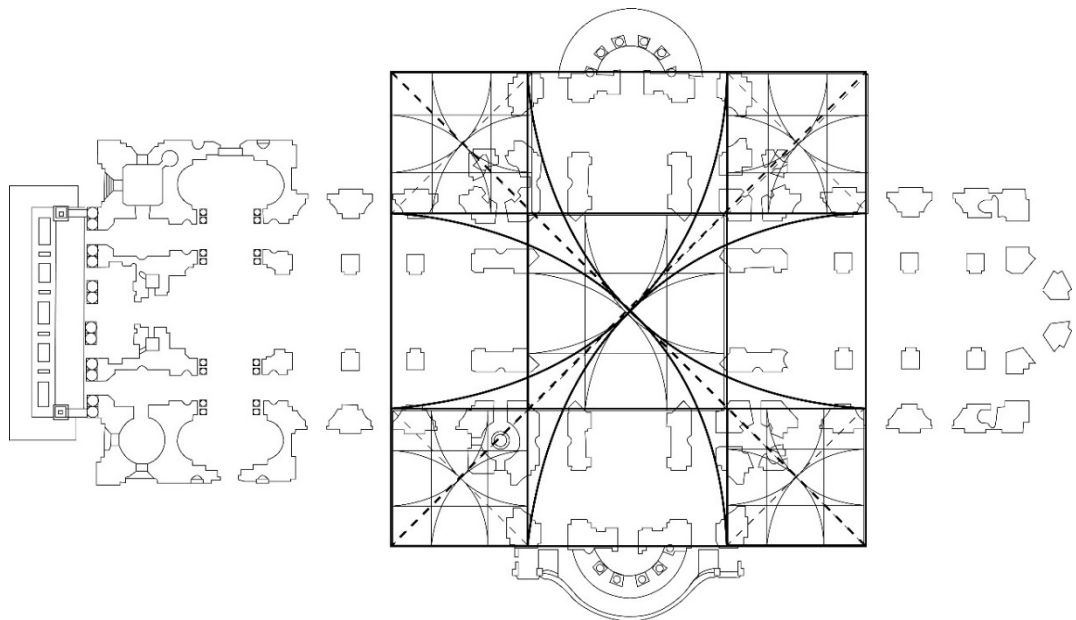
0 The golden-section and the root-two rectangle constructions in the St. Paul's Cathedral plan
